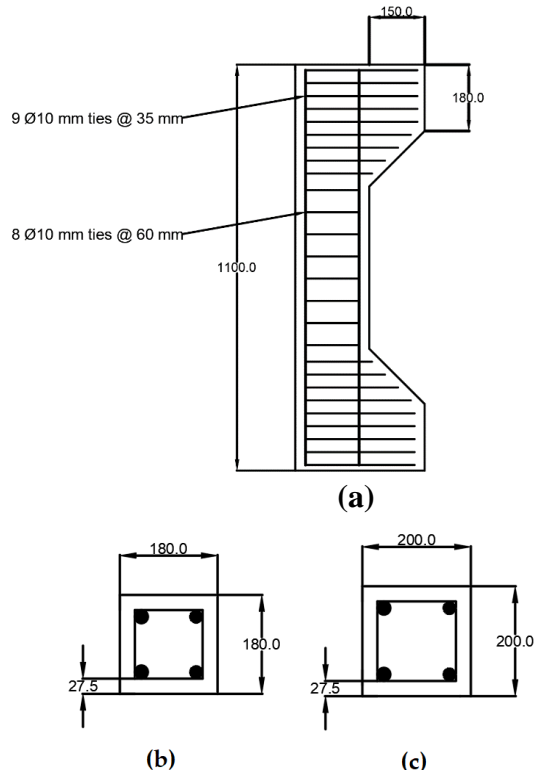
Rectangular FRP-RC column details: (a) column dimensions (b) cross section of 180 mm x 180 mm column (c) cross section of 200 mm x 200 mm column
